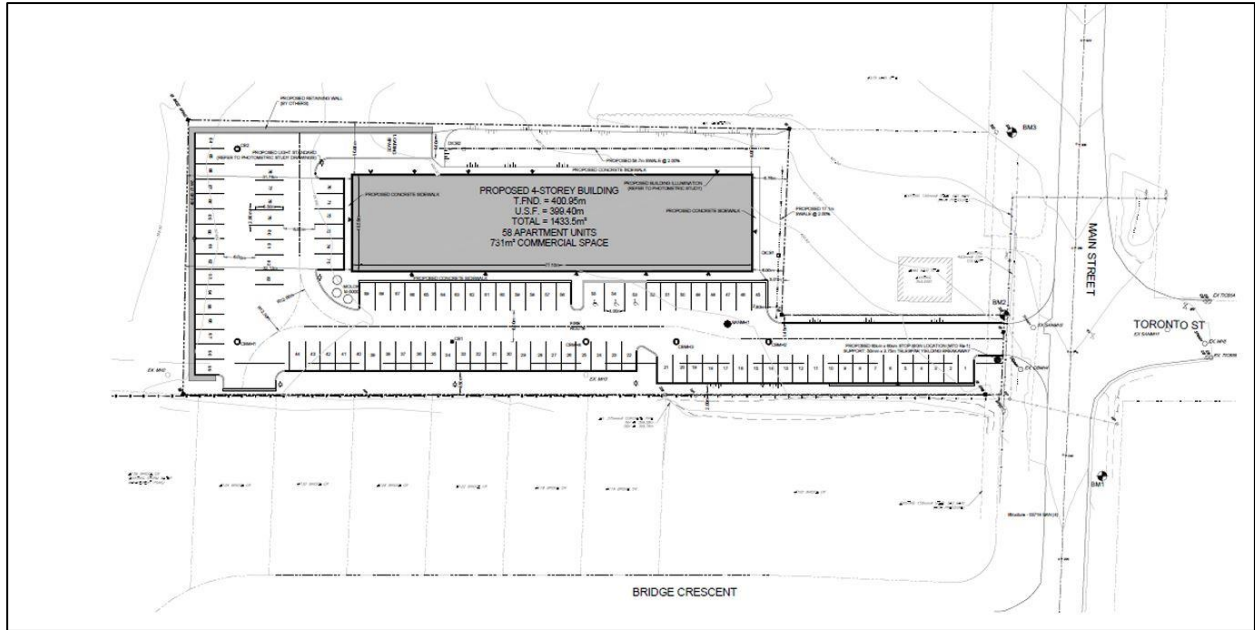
Proposed Site Plan prepared by Cobide Engineering Inc, August 2024
